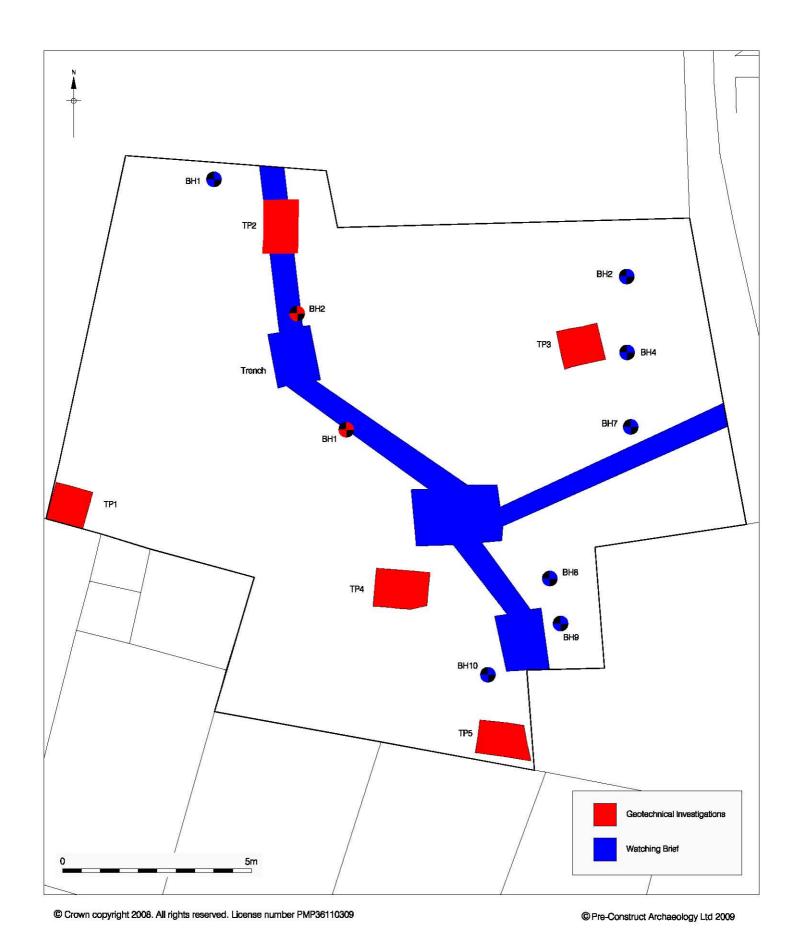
Trench, Test Pit and Borehole Location 1:100 at A4
